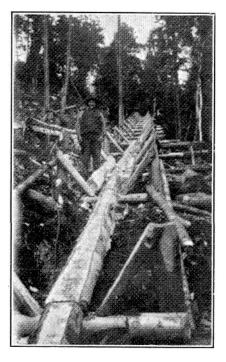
A pole chute under construction. All of the substructure was erected previous to the installation of thetrough. Eastern Canada.
